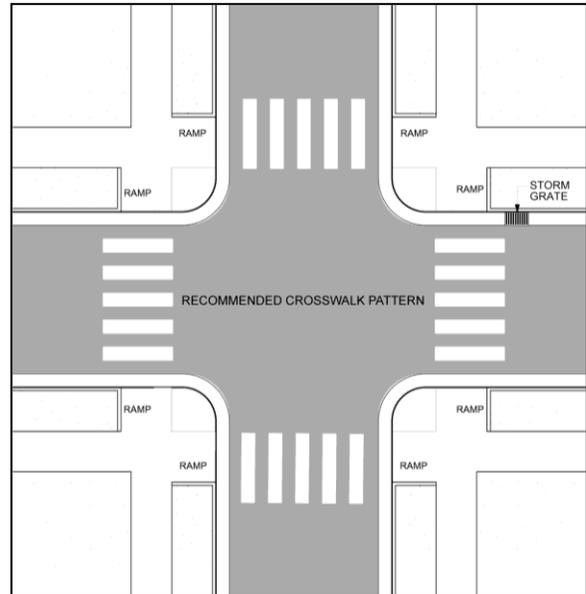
Sidewalk ramps should be placed in line with the crosswalk which will typically require two ramps per corner.
